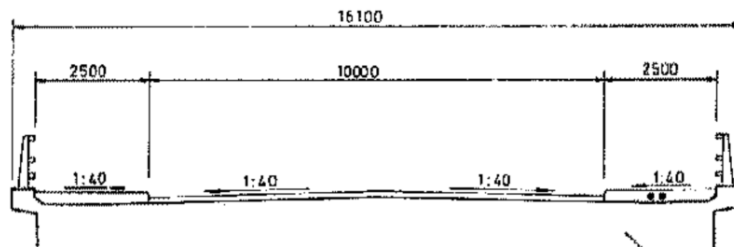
Existing Carriageway of Pitmore Copse Bridge
